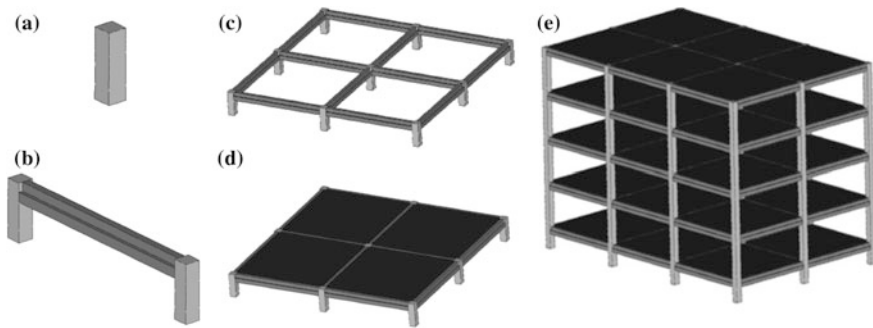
Scheme of the RC structure (e) and its main elements: a “one column”; b “2 columns–beam”; c “9 columns–12 beams”; d “9 columns–12 beams–4 floor slabs”
